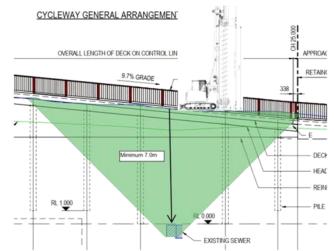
Zone of influence (ZOI) section of cycleway piers & slab
